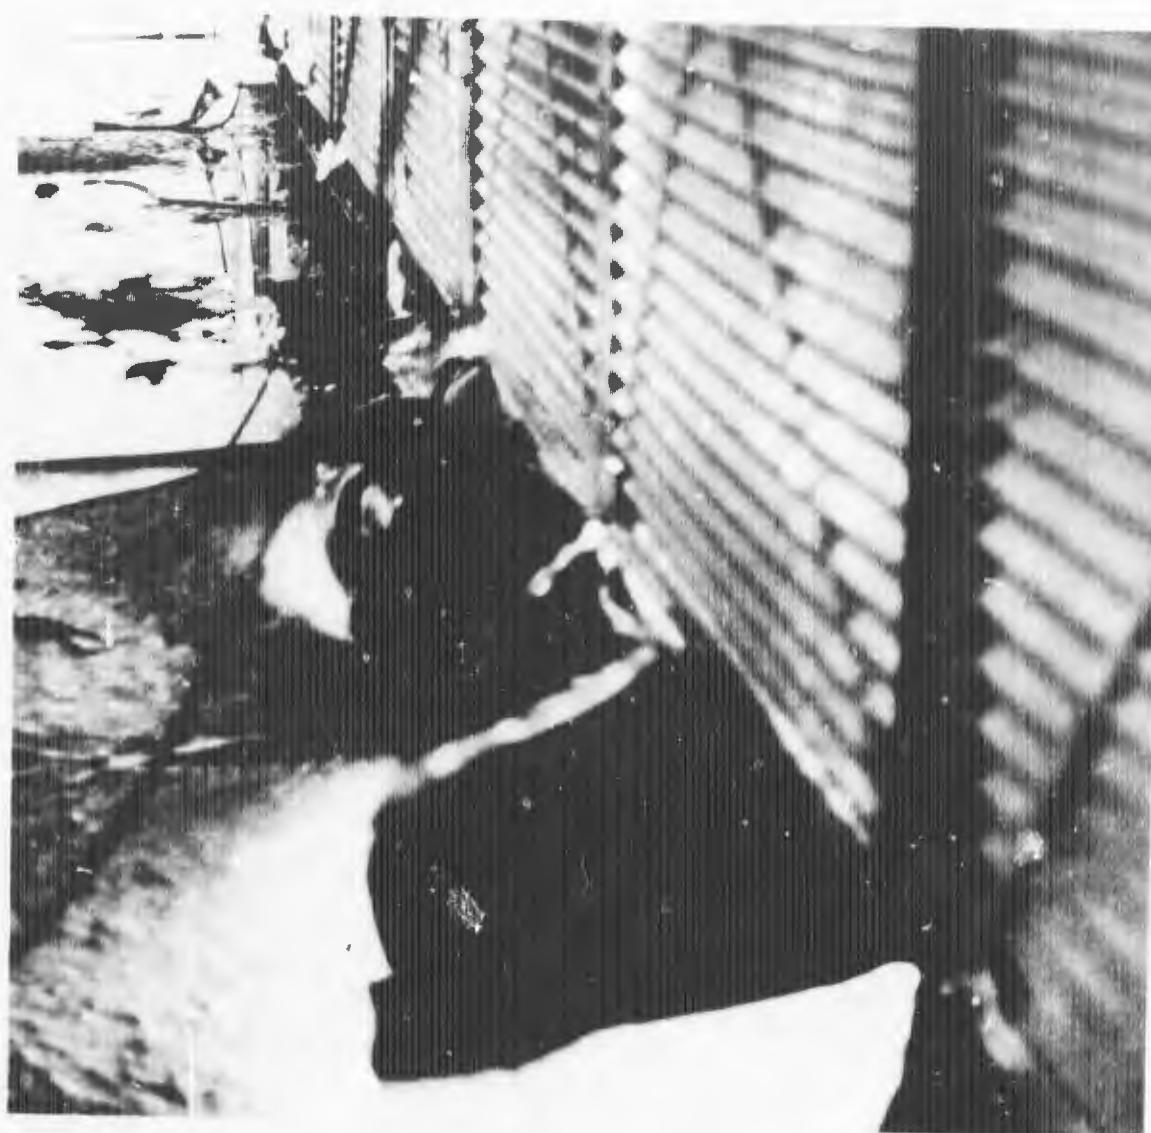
Water Leakage Under Metal Door and Ground Skirt Being Blown Inward
